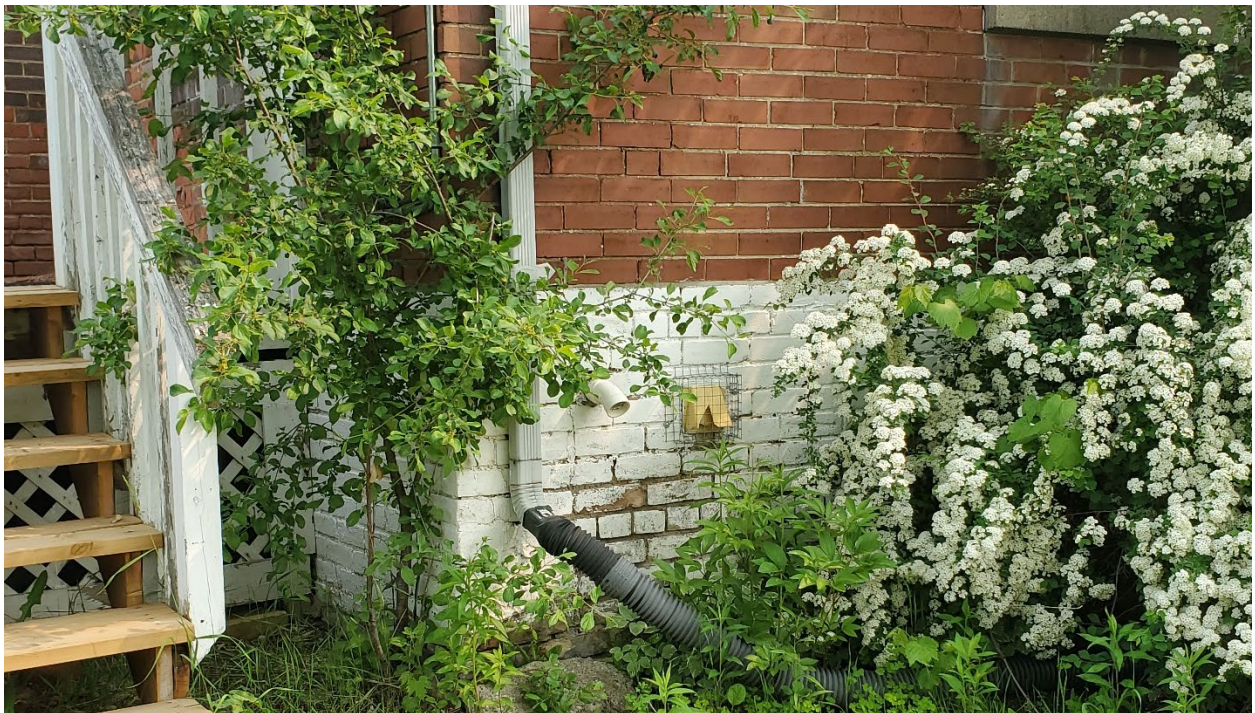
View northeast of the painted, common bond brick at the base of the building and atypical common bond brick pattern on the south elevation of the building
